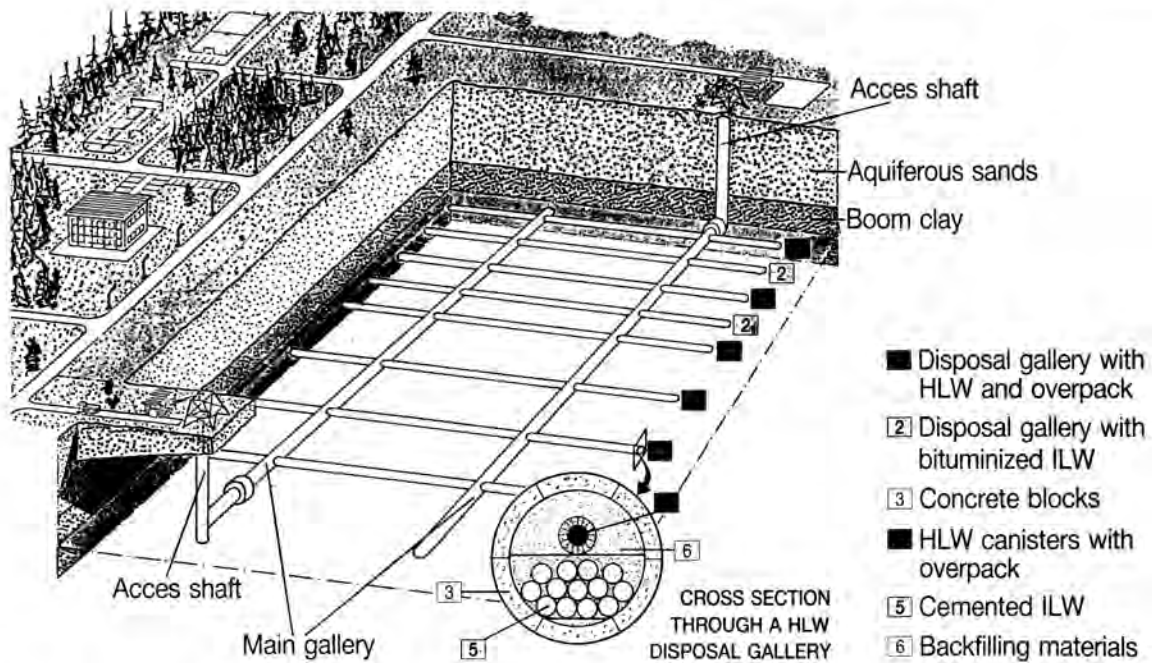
General Layout of Underground Facility for Radial Disposal Concept.
